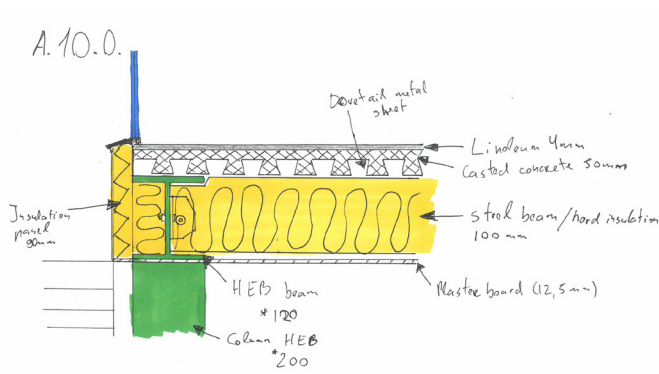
Sketch: Connection of the support steel columns with the floor of the extension
